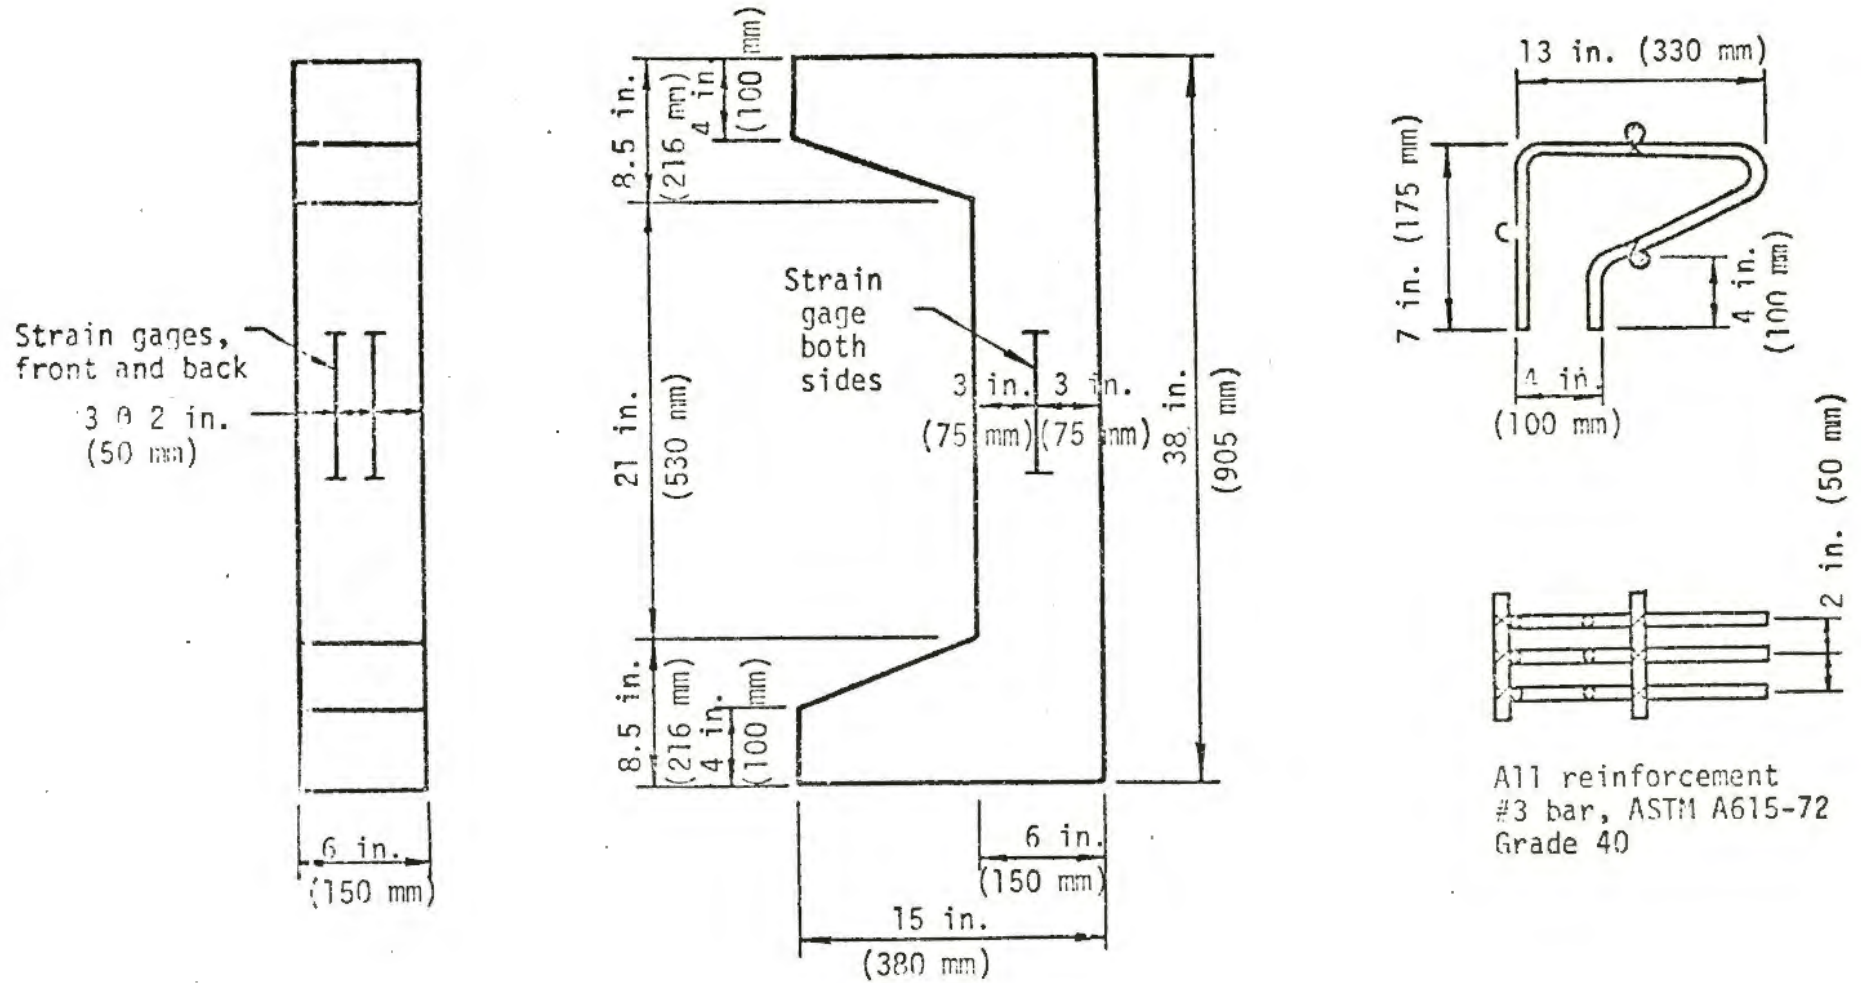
DETAILS OF BEAM-COLUMN AND CAPITAL REINFORCEMENT
